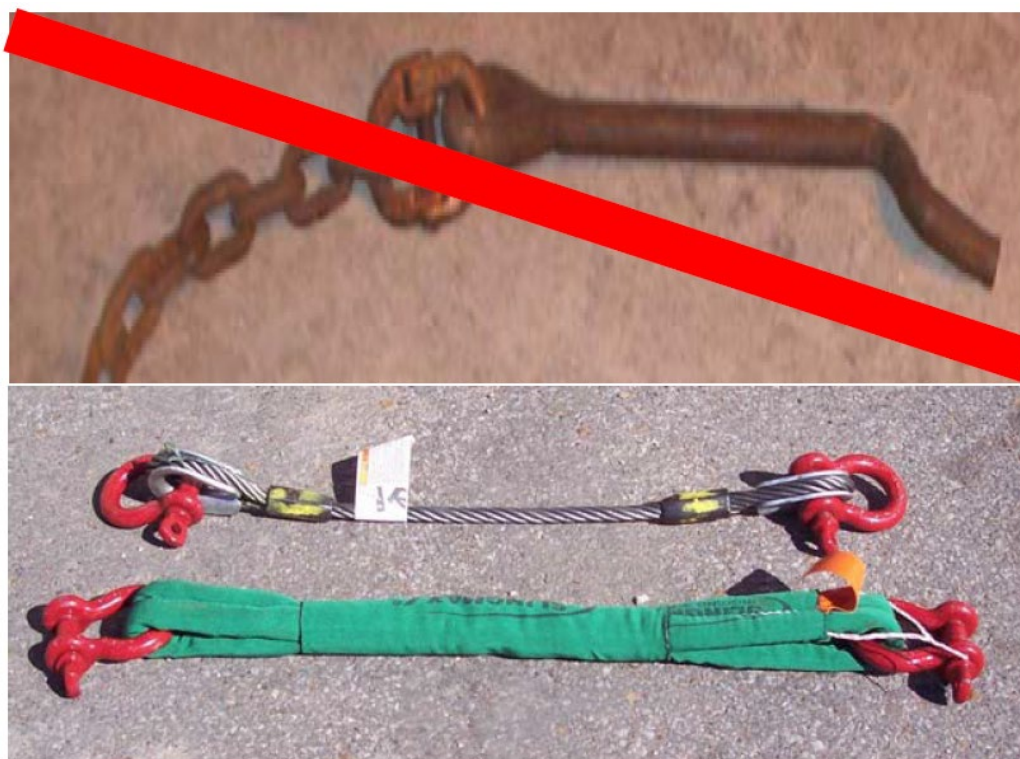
Figure SUB-PART D – 62 – Do Not Use Chains or Pigtails for Rail Unloading; Use Nylon Slings or Steel Cables
